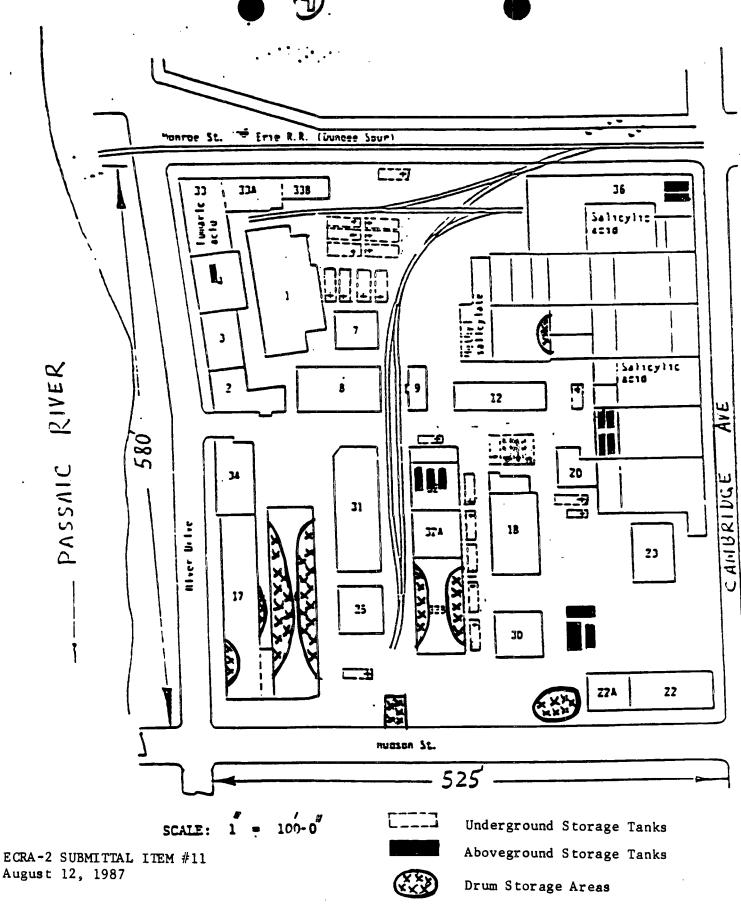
Kalama Chemical's garfield, New Jersey Site Plan showing underground tanks, aboveground tanks and drum storage areas
